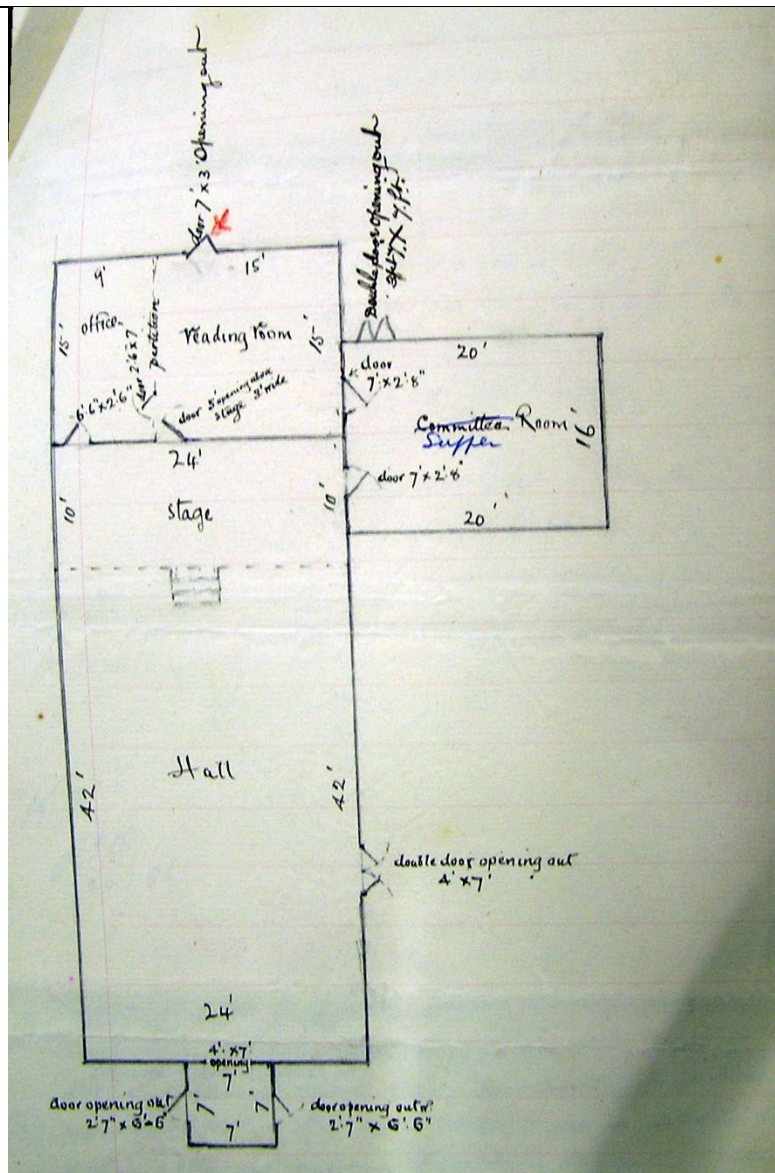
Sketch floor plan of the Blackwood Mechanics' Institute, 5 September 1895.
